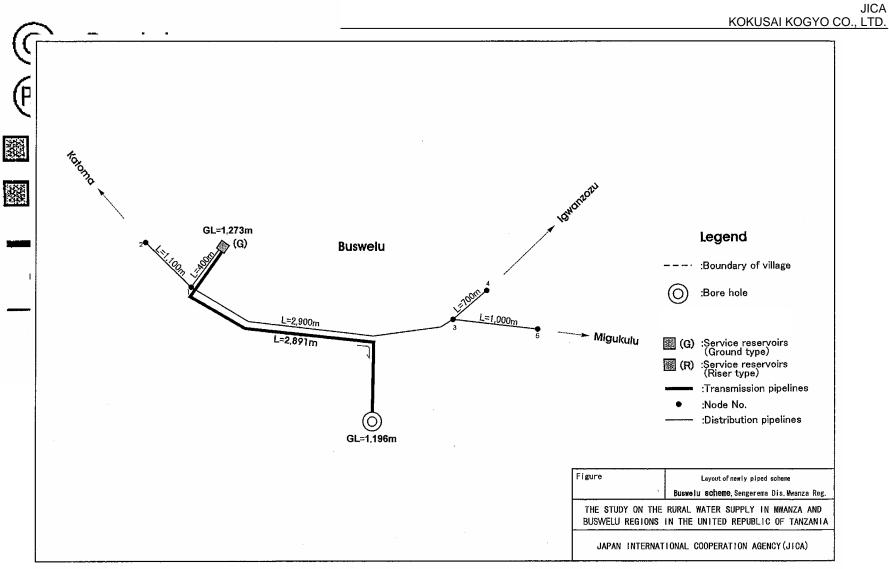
Layout of Newly Installed Piped Scheme (Buswelu Scheme)
